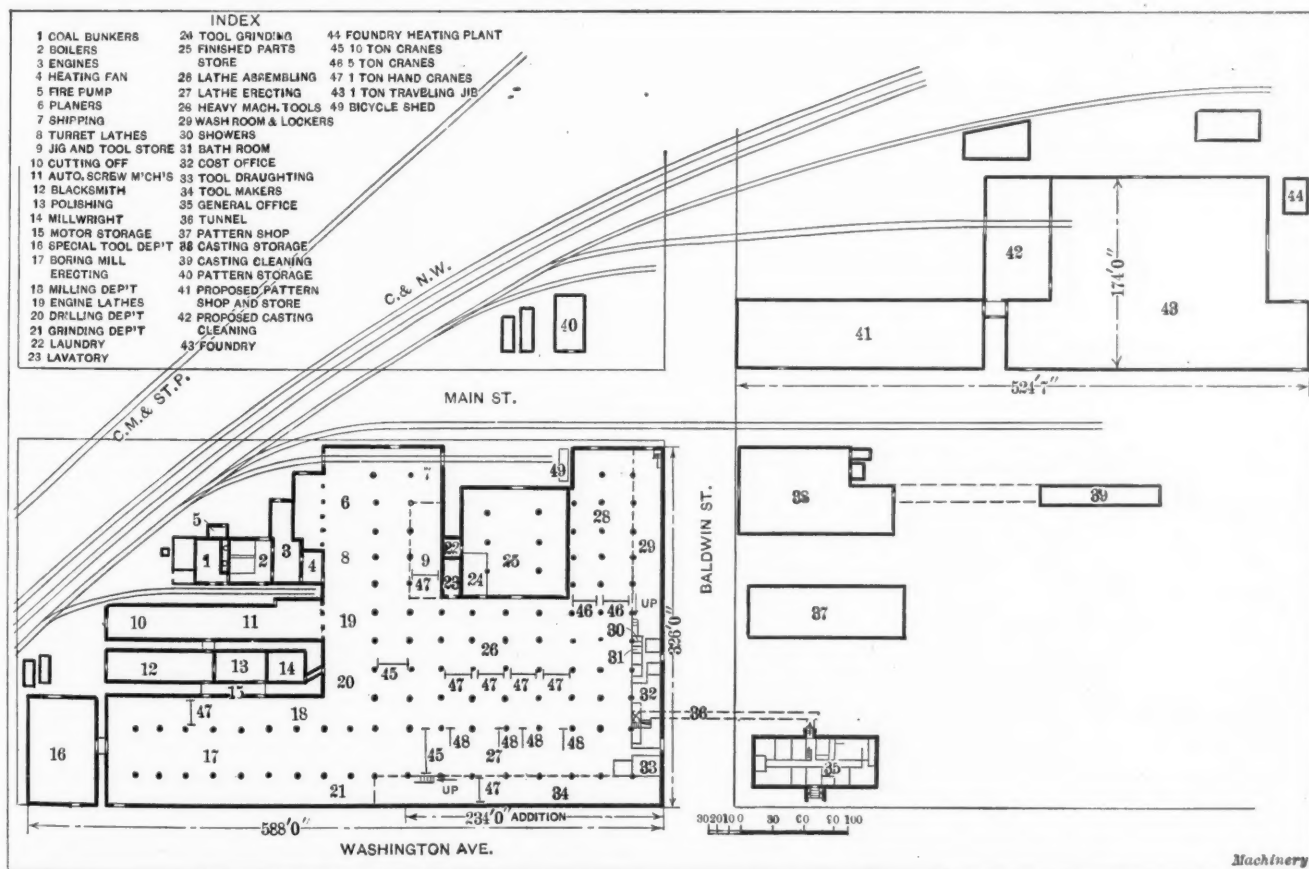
Plan showing Location of the Various Departments and Buildings, Gisholt Machine Co., Madison, Wis.
